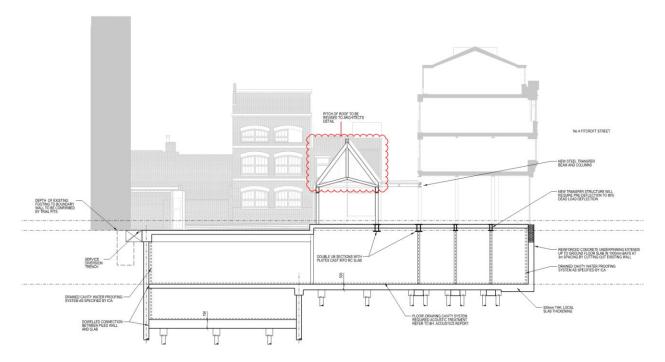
Proposed basement at 4 Flitcroft Street.
